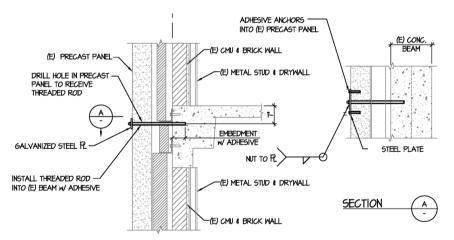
Precast Panel Connection to Existing Concrete Spandrel Beam
